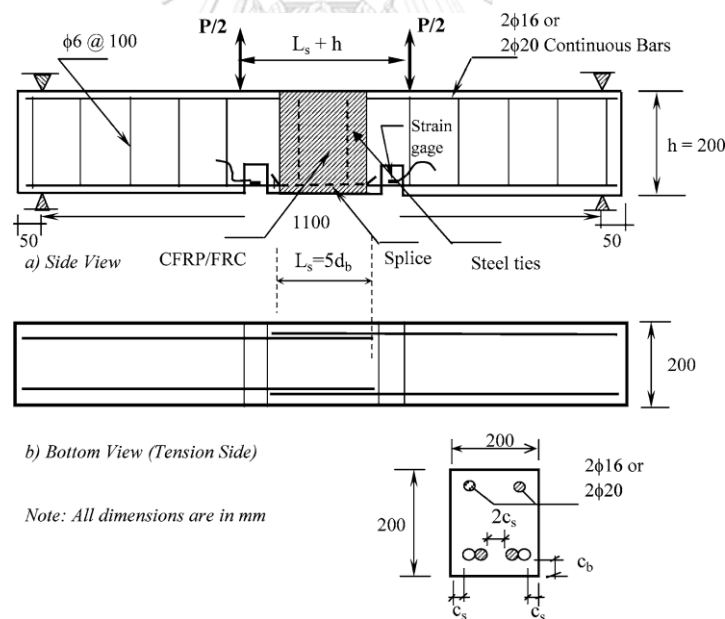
Beam splice specimens tested by Hrajli [59].
